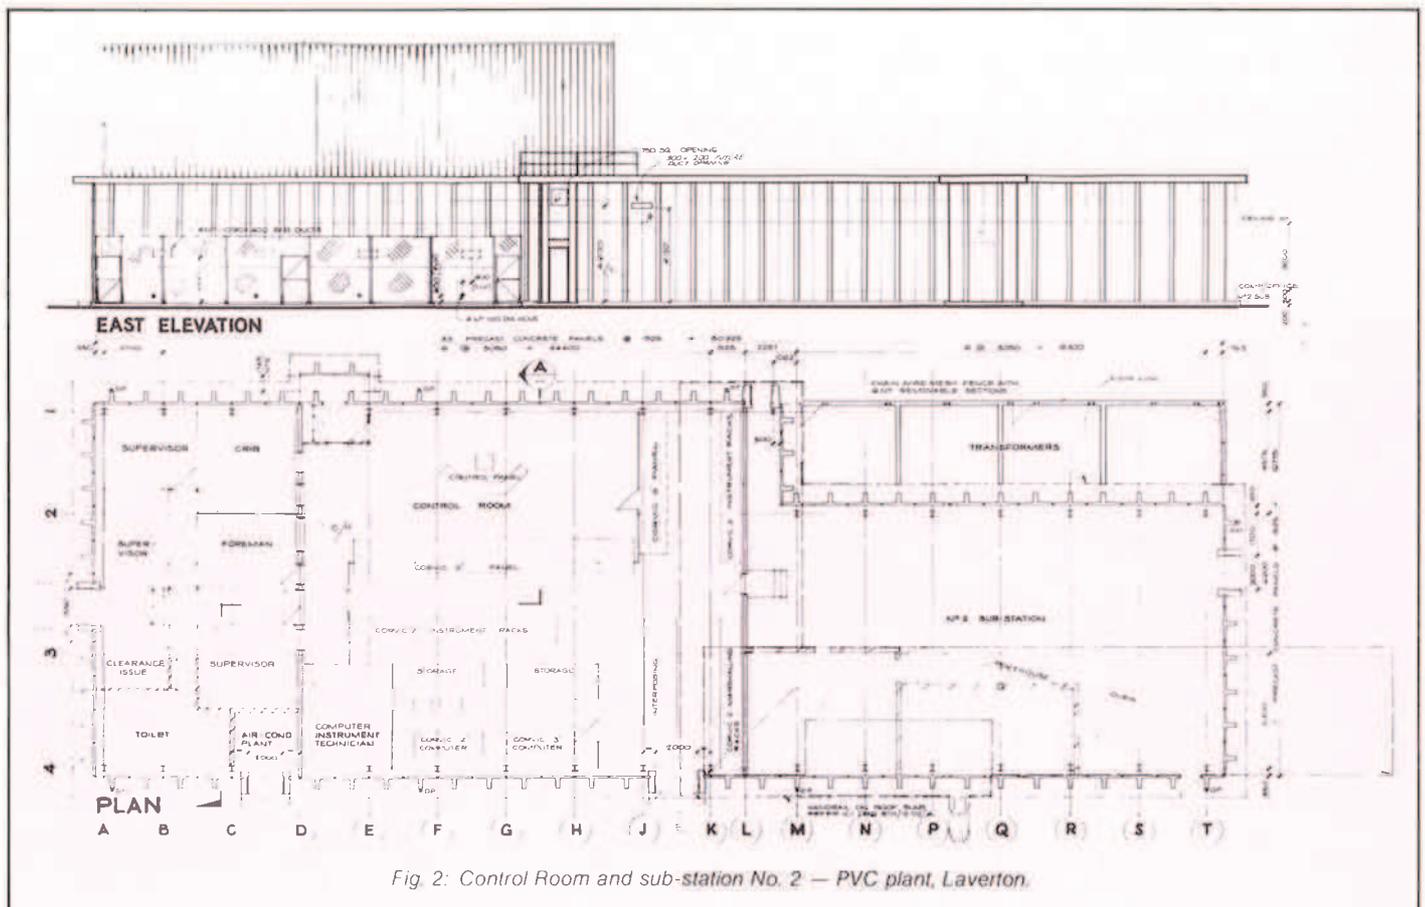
Control Room and sub-station No. 2 — PVC plant, Laverton.
